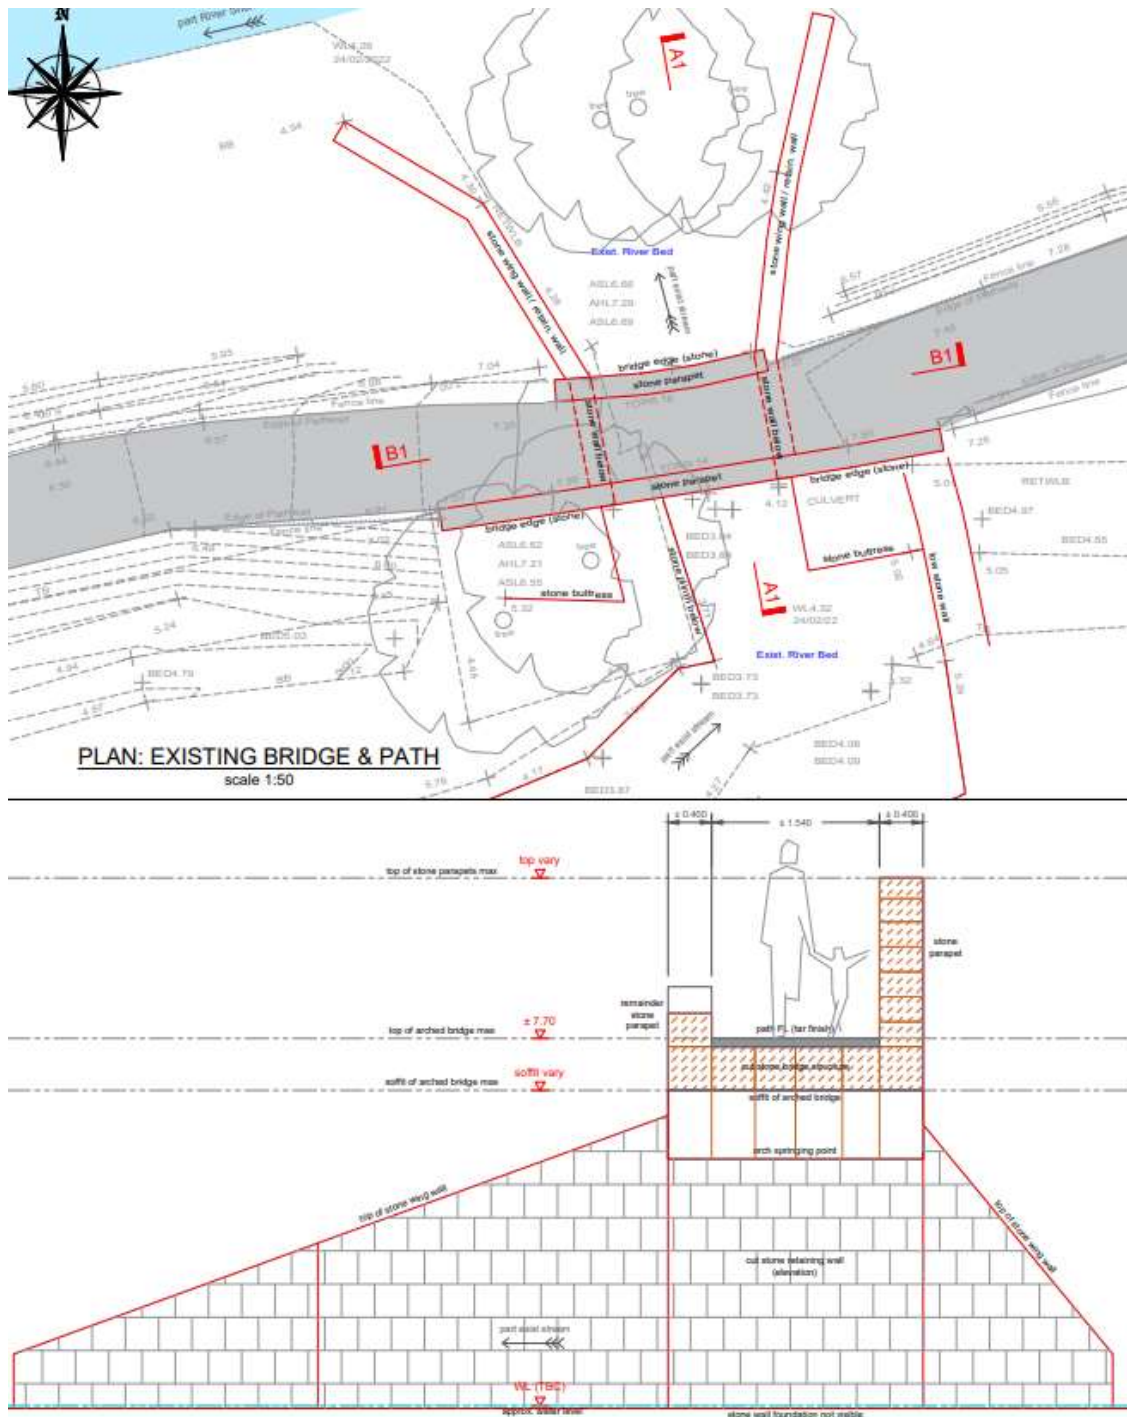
Existing plan and section for Bridge 2 (refer to drawing RHA-XX-DR-S-SP0020)
